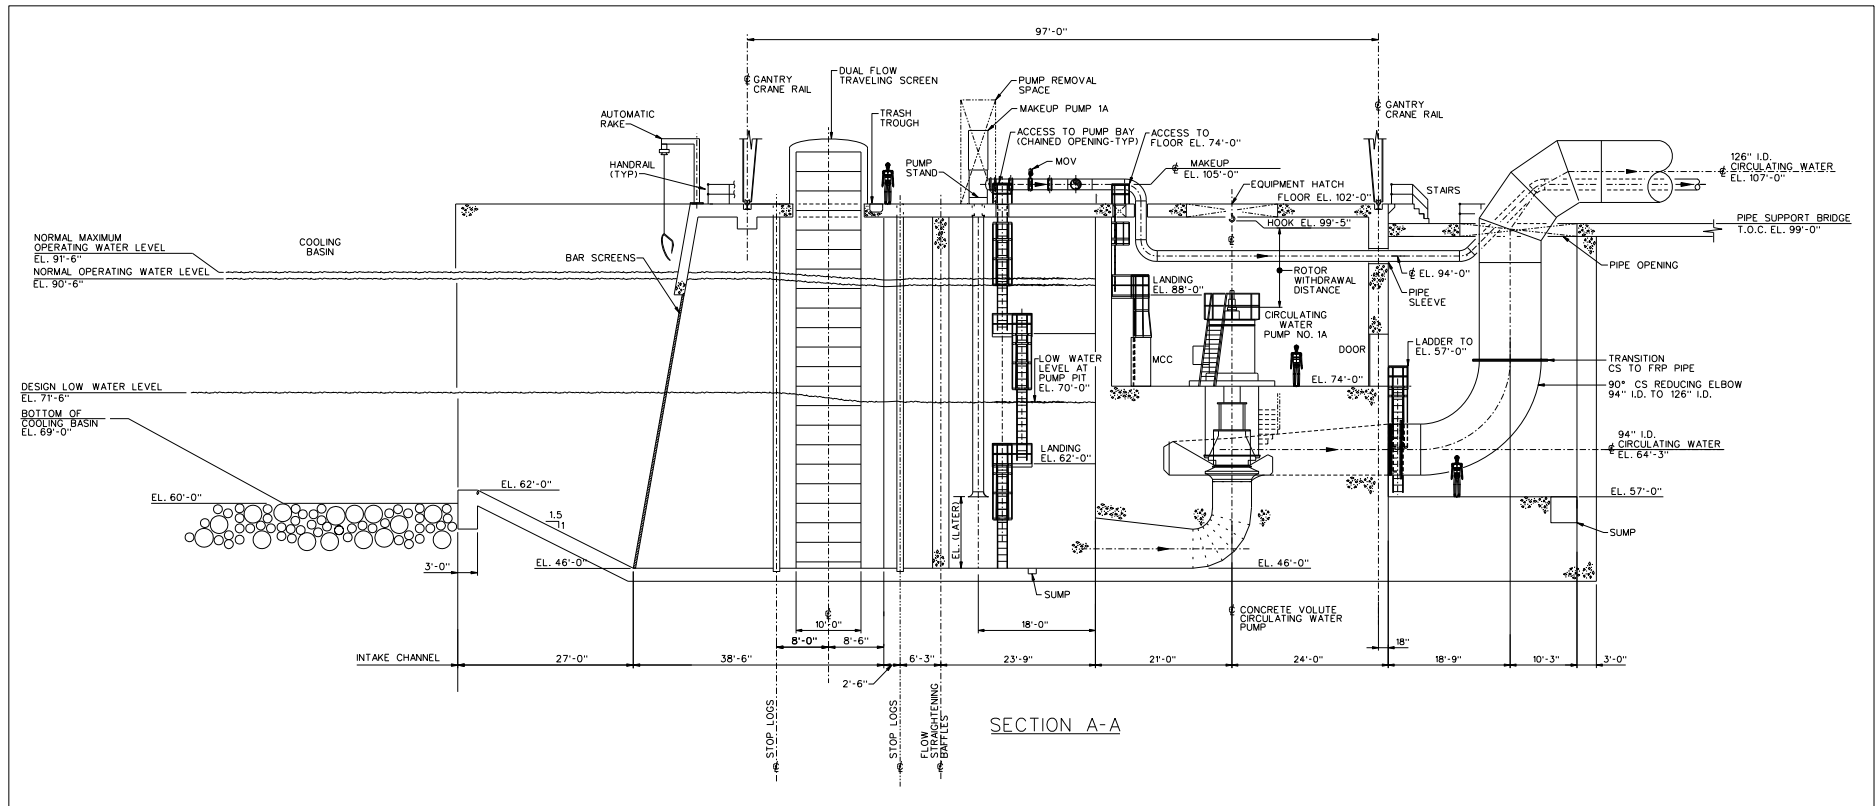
Cooling Basin Intake Structure (Section View) — Typical
